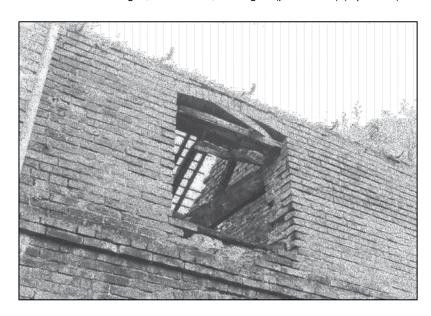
Building C, 1F truss over N 1F cell, viewed through 1F window in E elevation, looking W (photo 2/11).
